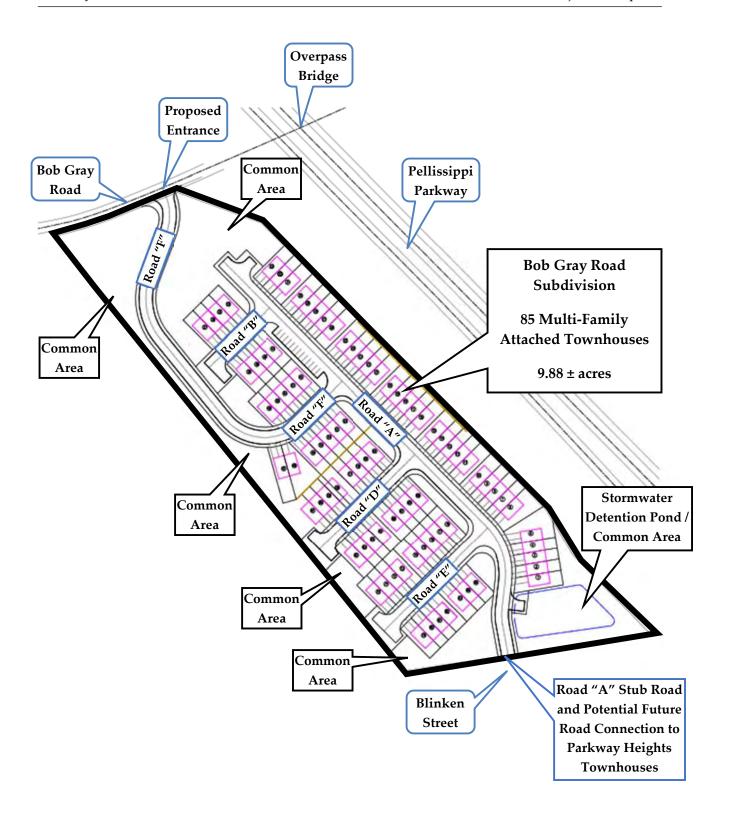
Proposed Plan Layout Bob Gray Road Subivision
